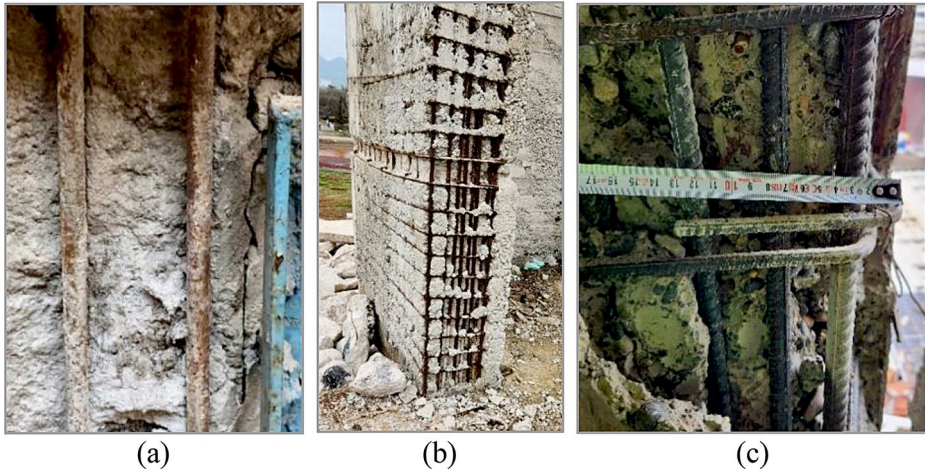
Unribbed smooth reinforcement and heavy corrosion (a), insufficient concrete cover and heavy segregation (b), and wrongly bent stirrups (90-degree bent) (c)
